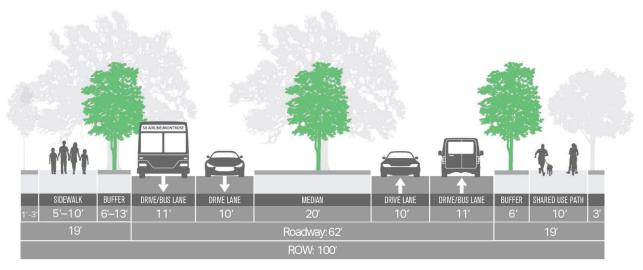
Recommended Typical Section: Westheimer Road to W Dallas Street
